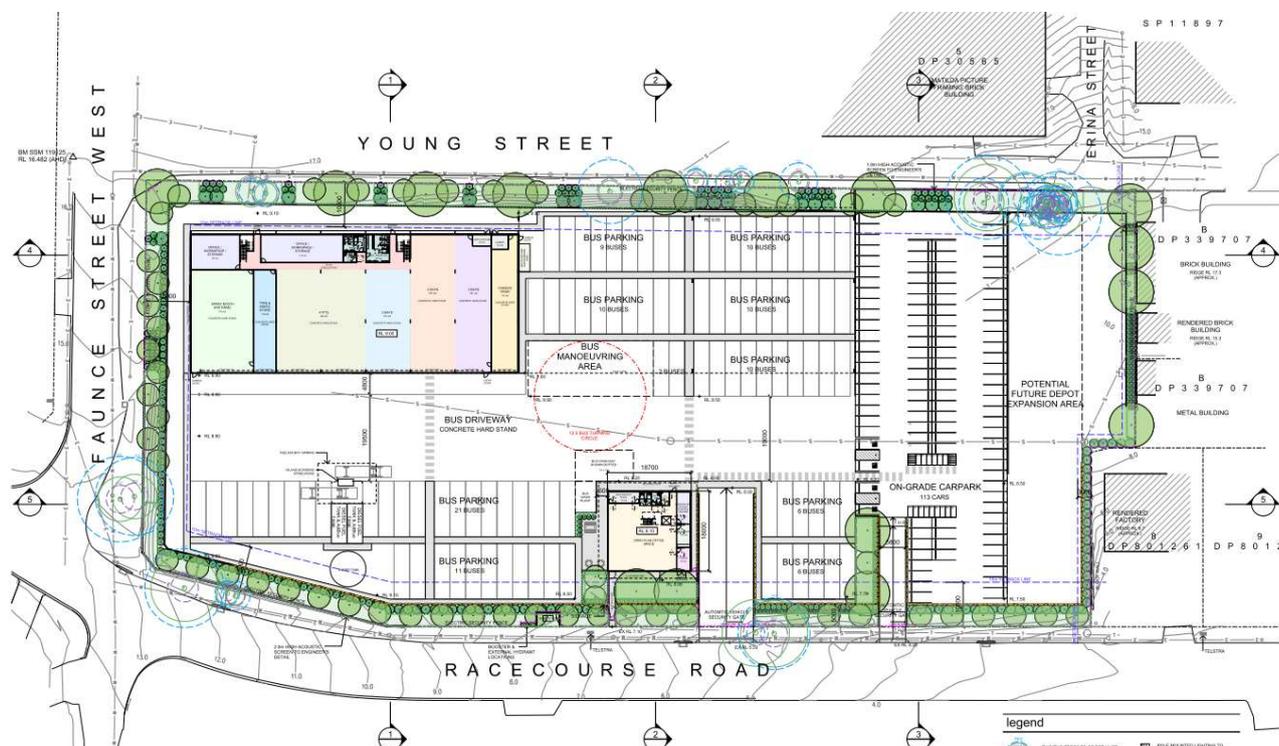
Proposed Site Plan (Courtesy of DEM)
